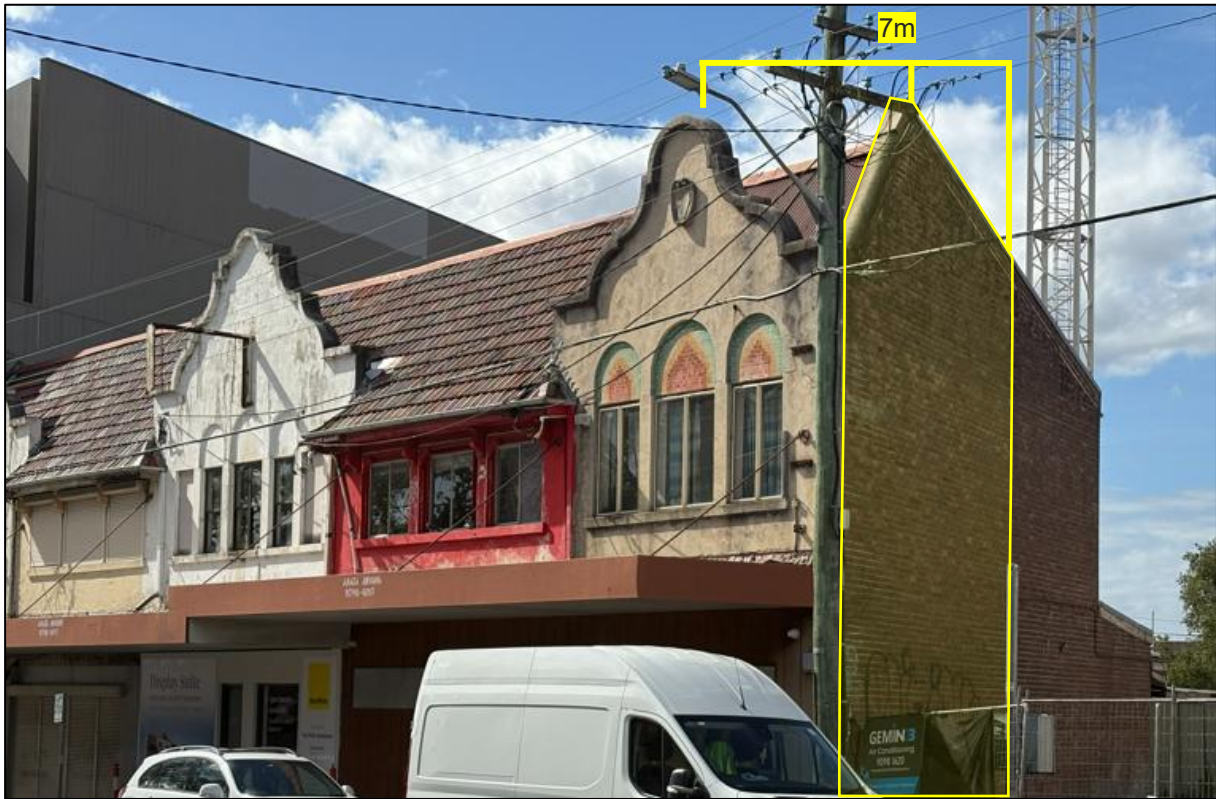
Mark up showing area where heritage curtilage should extend to on the southern façade, with the 7-metre setback.
